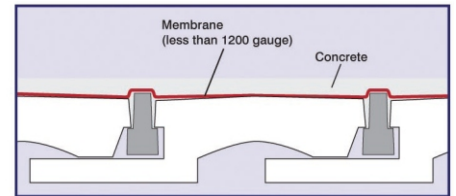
Floor construction using Poly-Plus panel with membrane barrier
